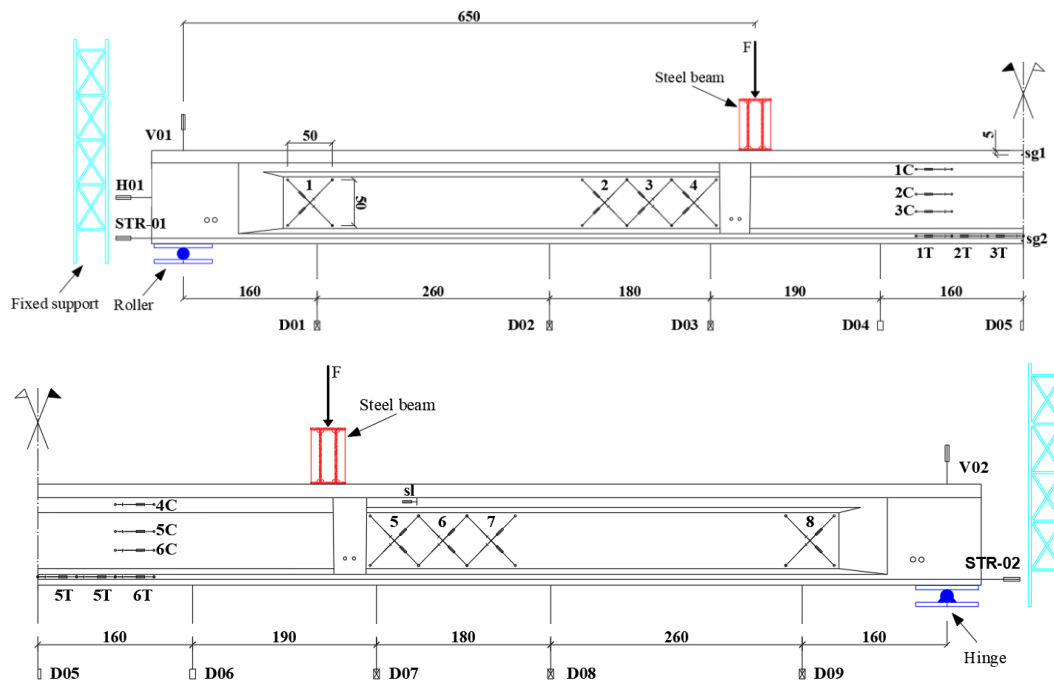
Test setup and layout of the monitoring system installed on B10-Ab/P47 girder (unit: cm).
